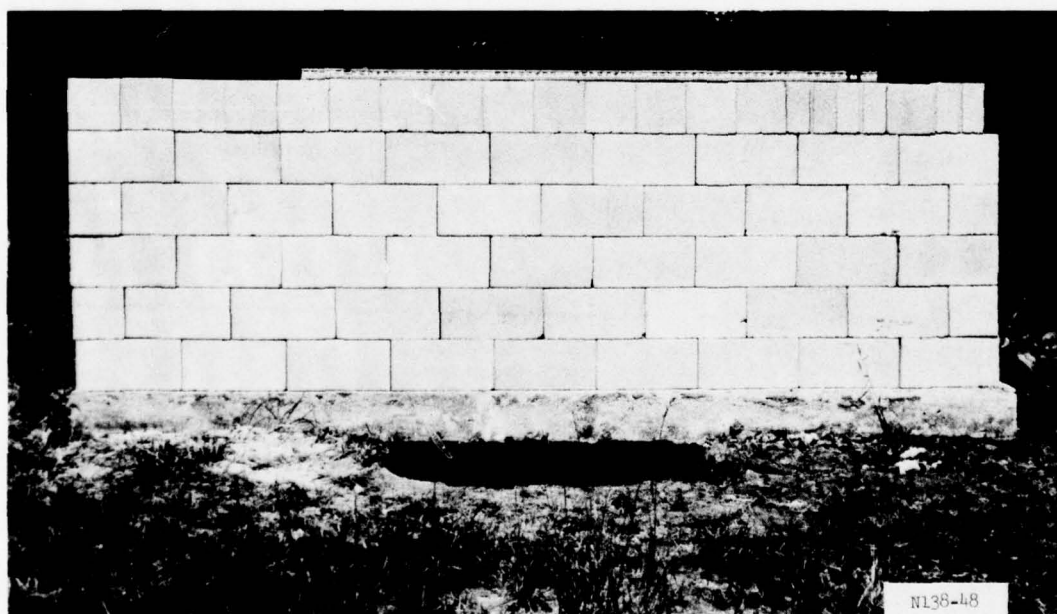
Unreinforced footing spanning a 4-foot trench.
